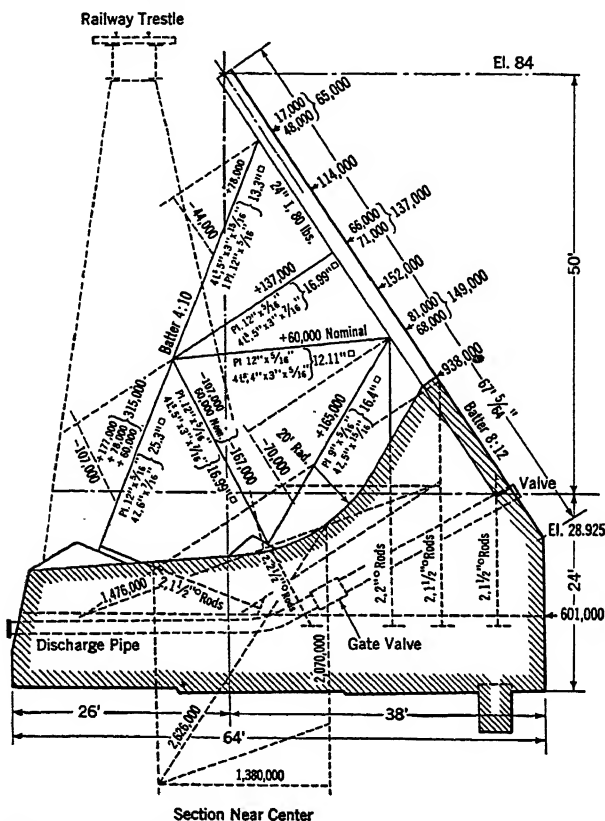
Cross-section of Redridge Steel Dam in Michigan. (From *J. Western Soc. Engrs.*, Vol. X, 1905.)
